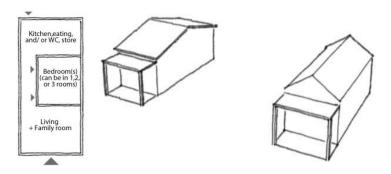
Typical floor-plan (left) and 3D illustrations of tube houses in TTH
